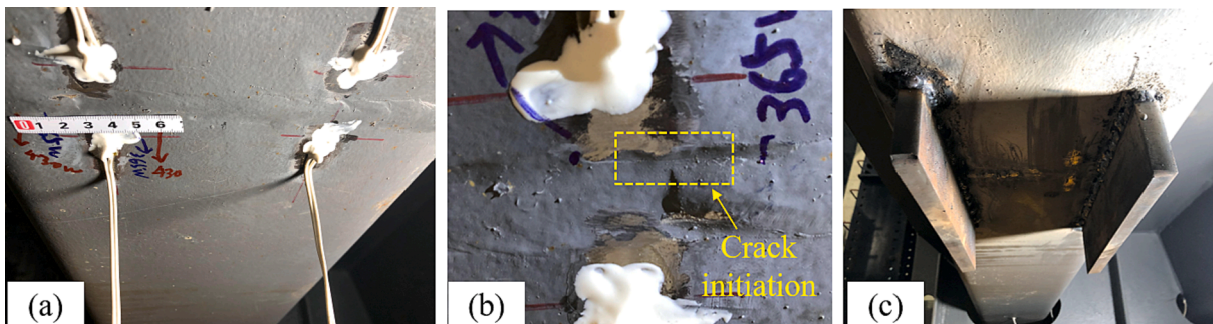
The U-rib butt-welded joint: (a) fatigue crack; (b) welding defects; (c) repairing and stiffening scheme.
